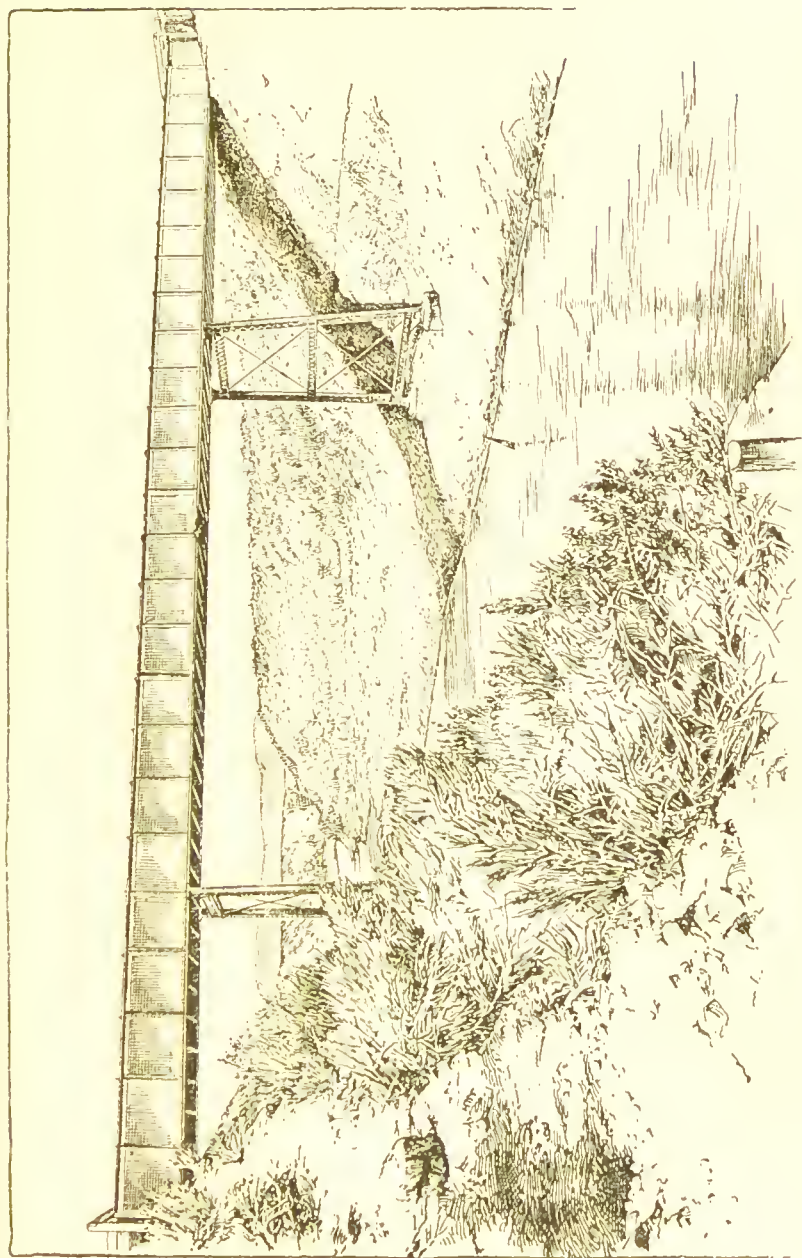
130-ft. Plate-girder Flume over Malad River.
